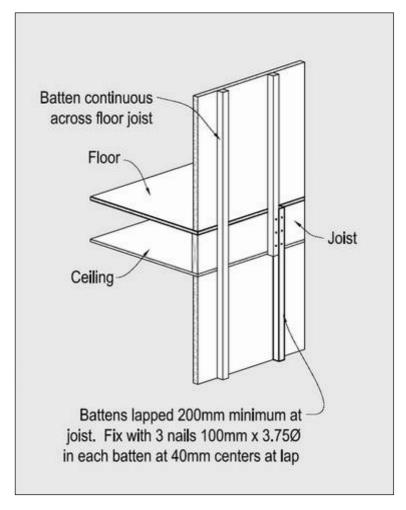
Two Storey Wall, Floor & Batten Detail
